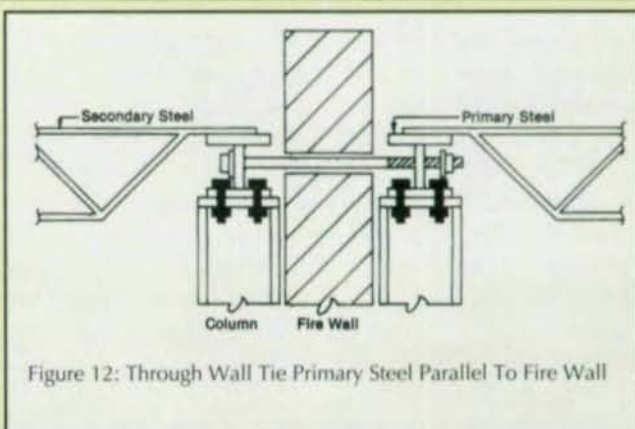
Through Wall Tie Primary Steel Parallel To Fire Wall
